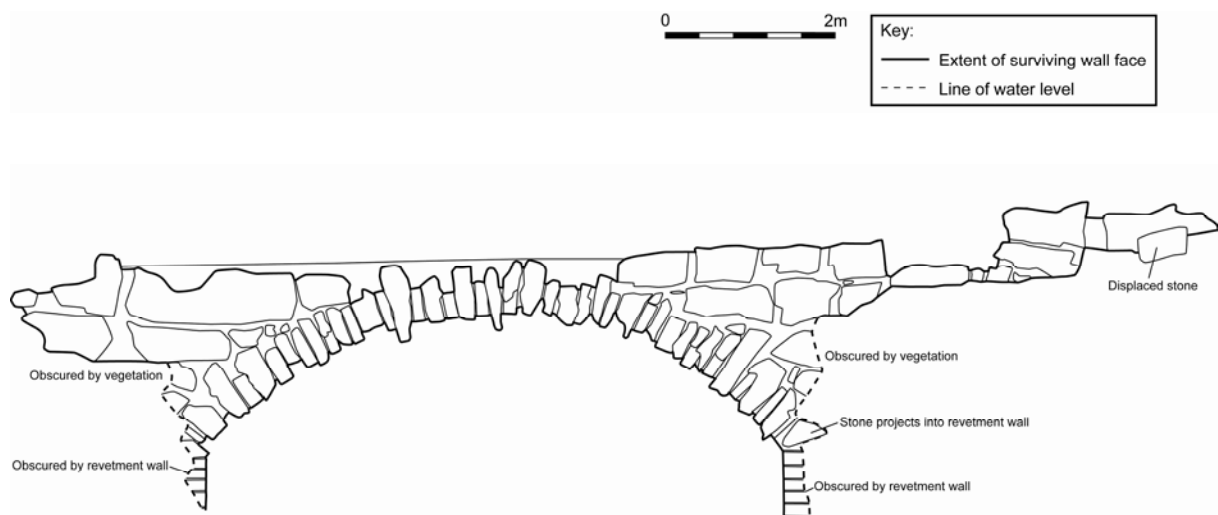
Structure 4, Rusticated Bridge #2 (Lower Bridge): Elevation d
